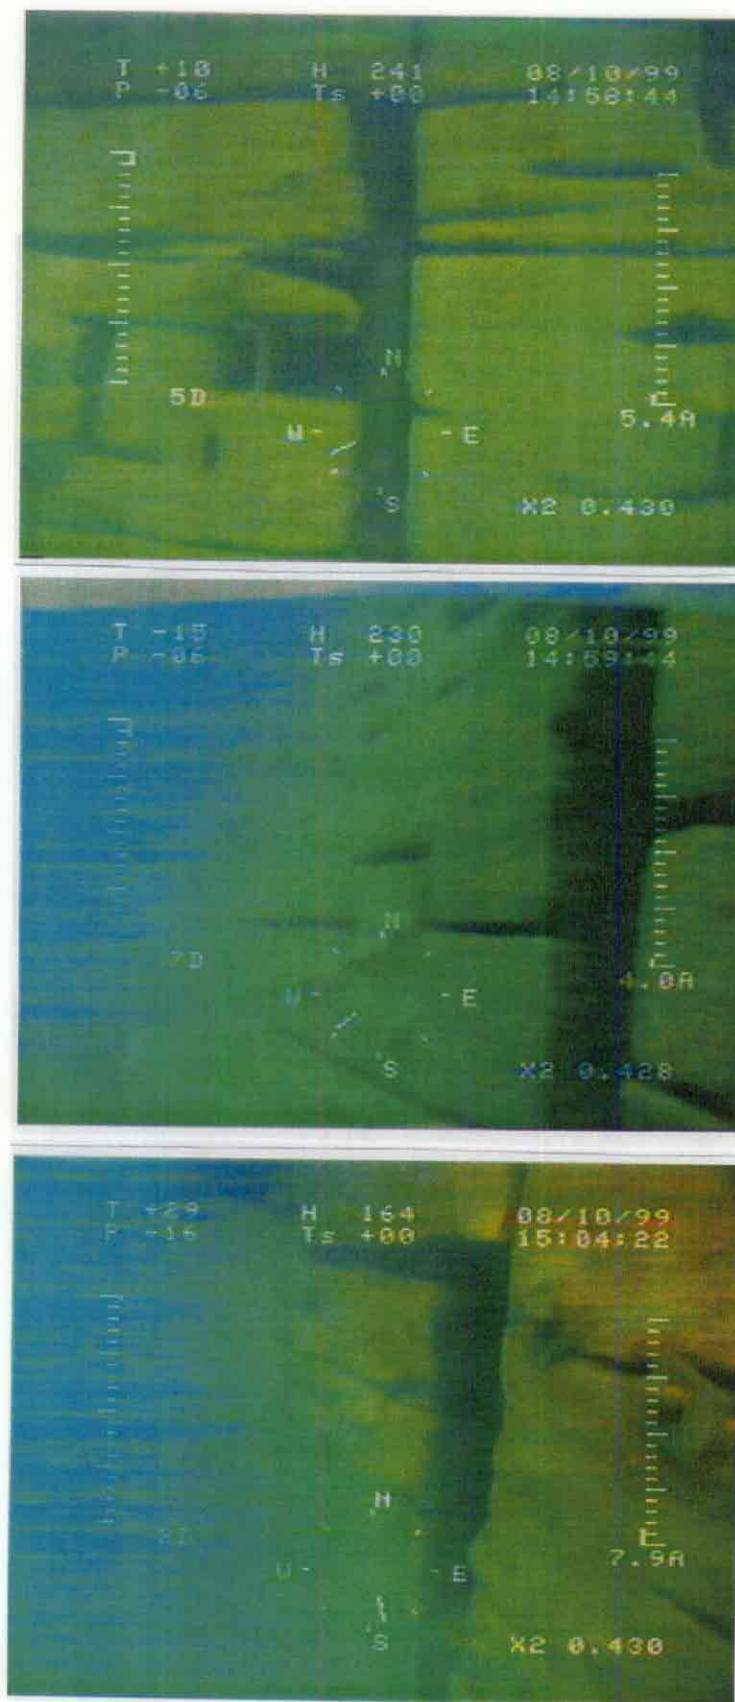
Video frame showing east jetty interior wall with open joints (1999).
